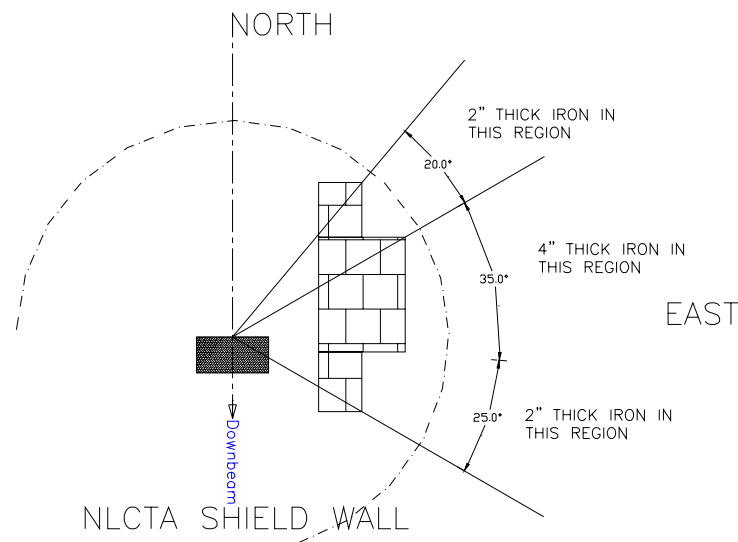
Faraday cup east shielding wall requirements. Wall height coverage 45 degrees up and 25 degrees down (shadows east wall floor to ceiling).
